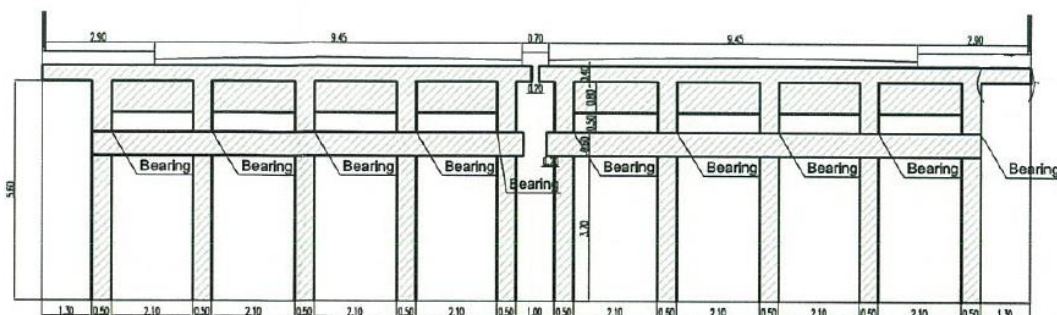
Longitudinal view of Support columns, disposition of transverse beam
